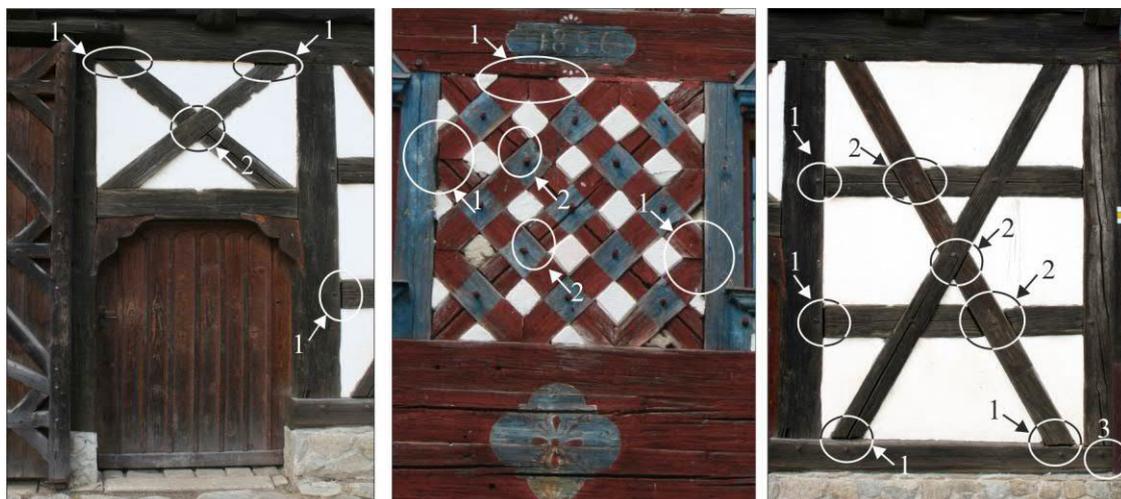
Examples of failures (loosened connections) of different carpentry joints (legend 1 – tenon jointing (struts, noggins, posts), 2 – dapping (struts, noggin), 3 – halving (foundation plate))
